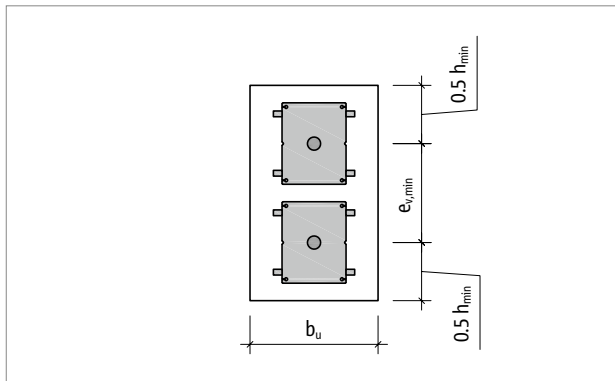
Schöck Stacon® type SLD: Minimum structural component measurements and dowel spacings in the front face of a balcony or a wall
